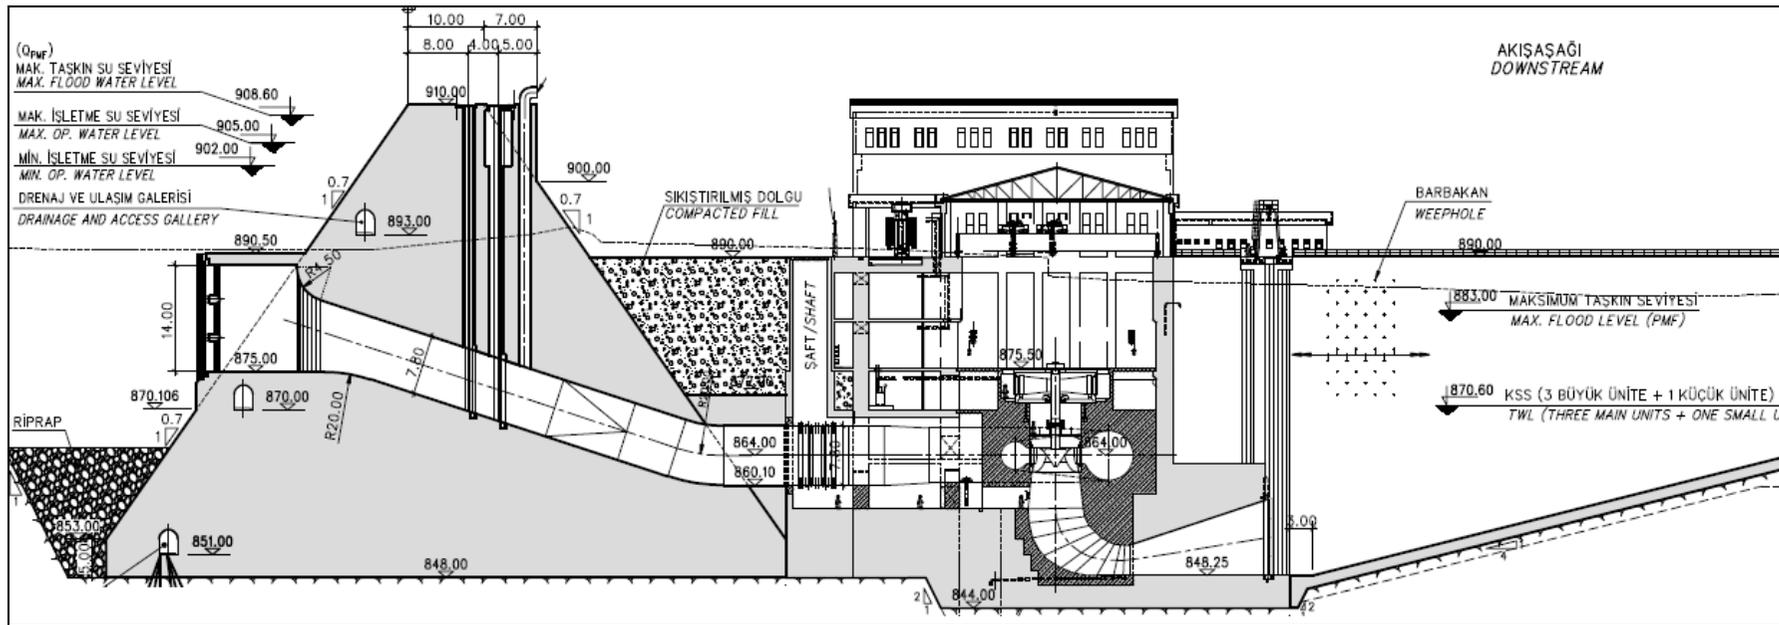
Typical cross section of Beyhan 2 Dam and HEPP (Temelsu International Engineering Services Inc., 2011)
